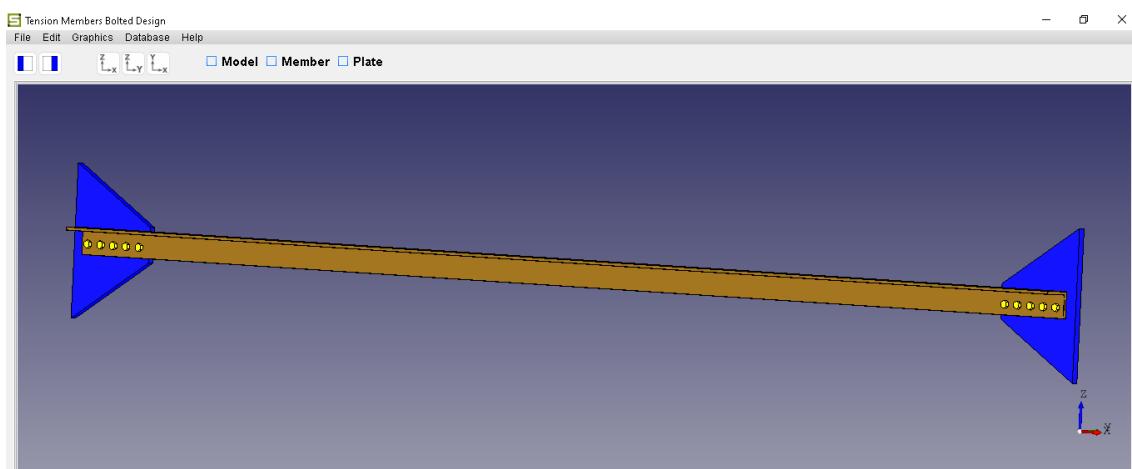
3D drawing output of typical Tension member Bolted connection
